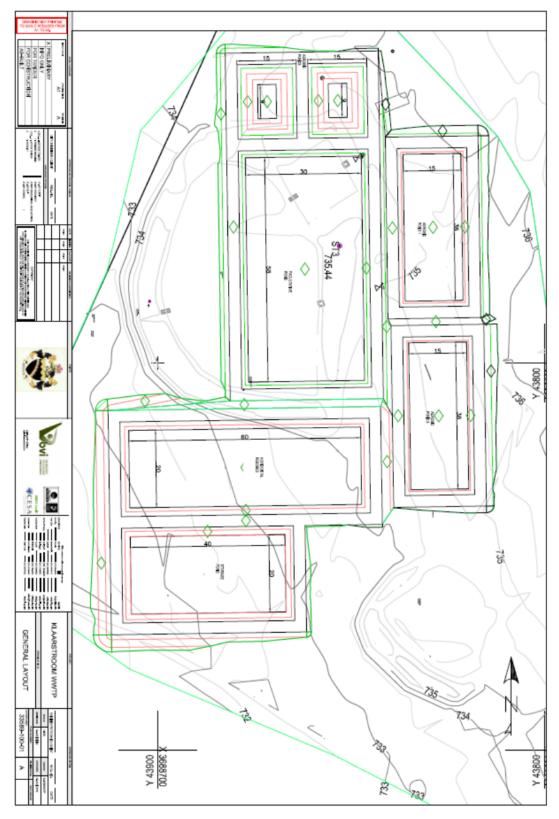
Klaarstroom Oxidation Pond System Site Layout
